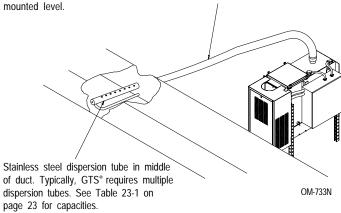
Steam Supply Using Pipe or Tubing (Flange option available)
